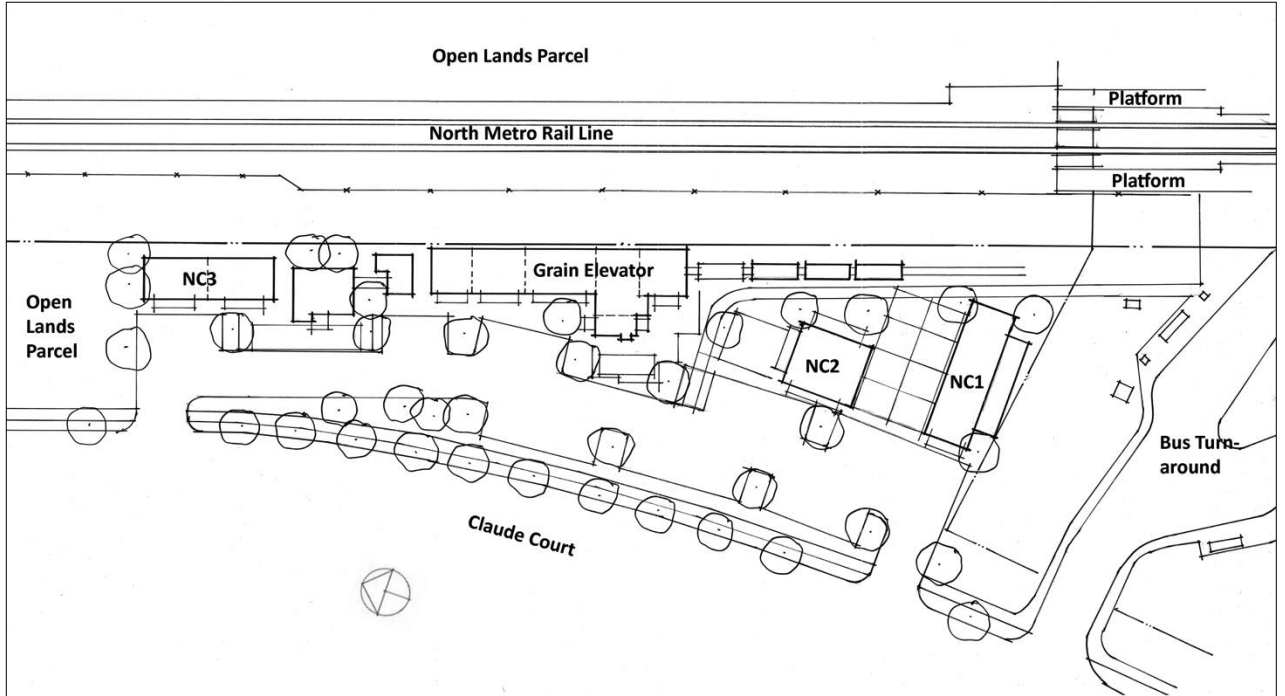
Conceptual Layout of Grain Elevator and New Buildings (with potential uses)
